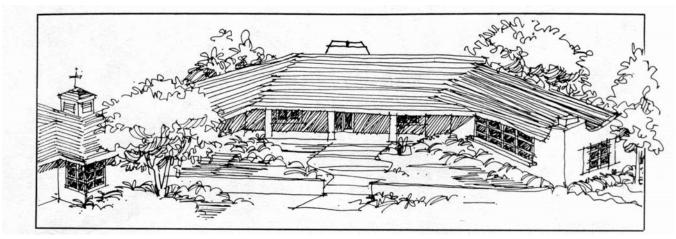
Informal, rambling plan form allows the structure to fit with the topography and major boulder formations.
